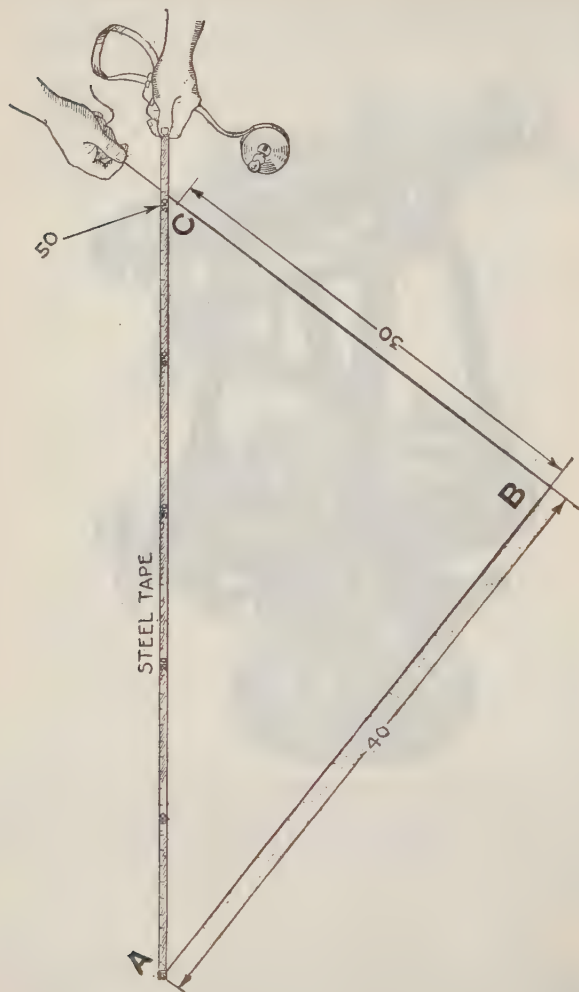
Method of laying out lines for a rectangular building by aid of diagonals. This is virtually the process of constructing a large layout square, using lines and steel tape in place of boards.
